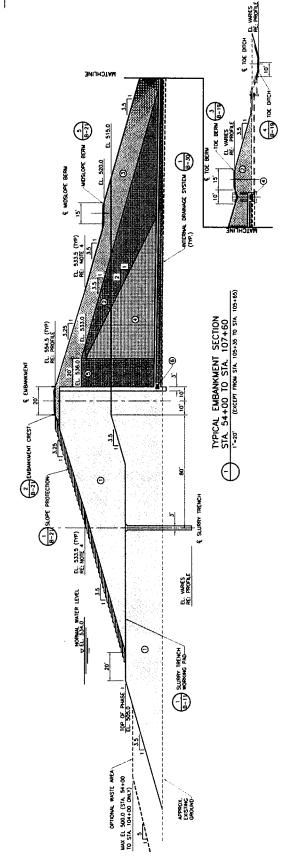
Typical Section – Station 54+00 through Station 107+60
